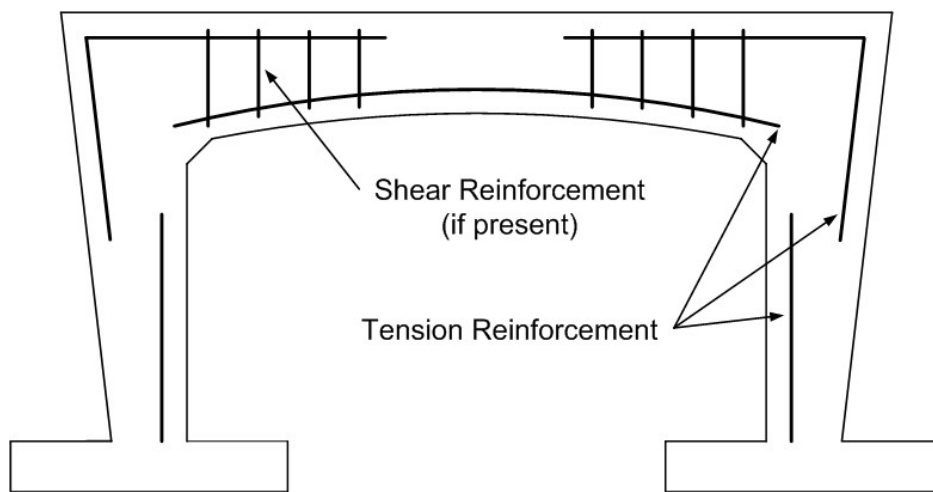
Primary Reinforcement in a Single Span Frame
